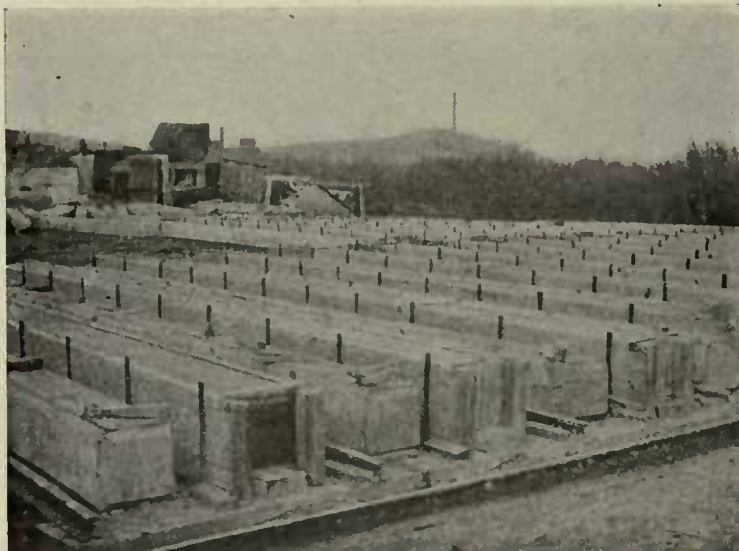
SQUARE MOULDED CONCRETE PILES.
